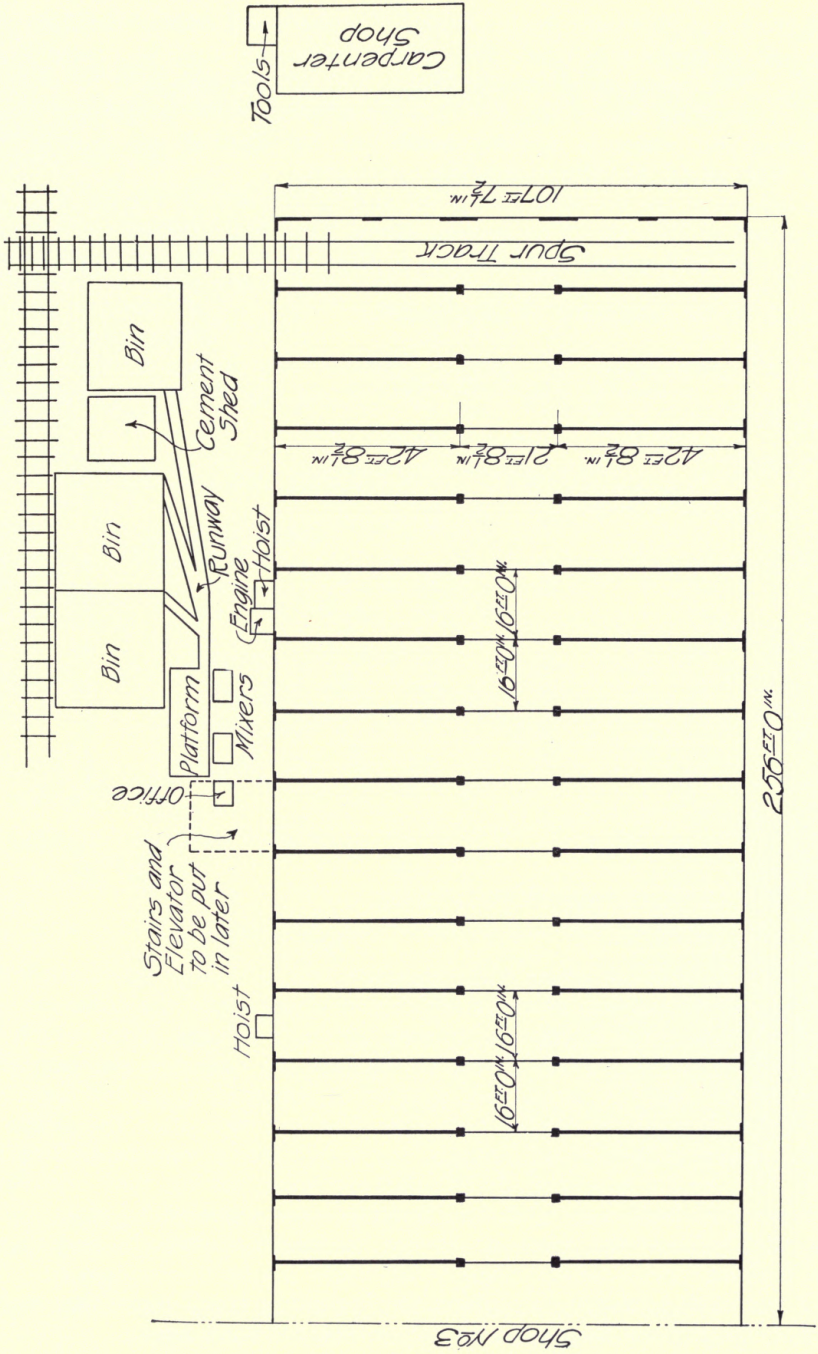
Plan of Machine Shop, with Construction Plant. (See p. 96.)
